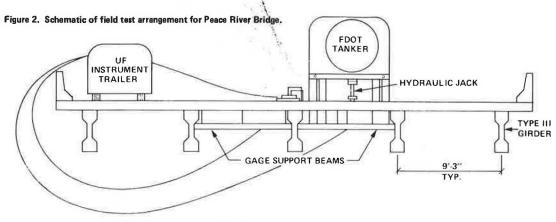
shows the truck in position for one of the hydraulic tests with the load in the center of a panel. All figures that show transverse sections of the bridge were drawn facing north. Figure 3 shows the detailed plan location of the loadings. Figure 3a shows the positions of the hydraulic loadings. Loads A, B, C, and D refer to different positions of
